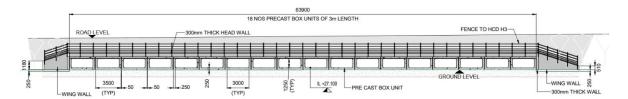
Elevation of the flood alleviation culverts in the Scheme design
